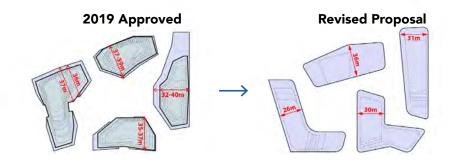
1st and 2nd Floors - Floor Plate Dimensions
